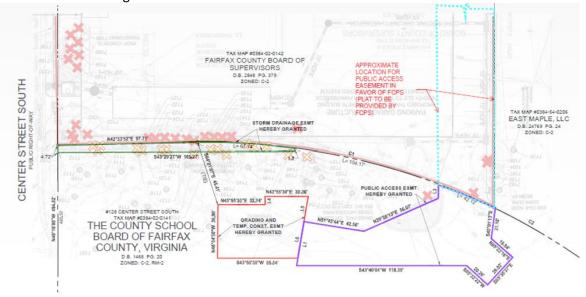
Proposed landscape plan overlayed with proposed off-site easements plat.
